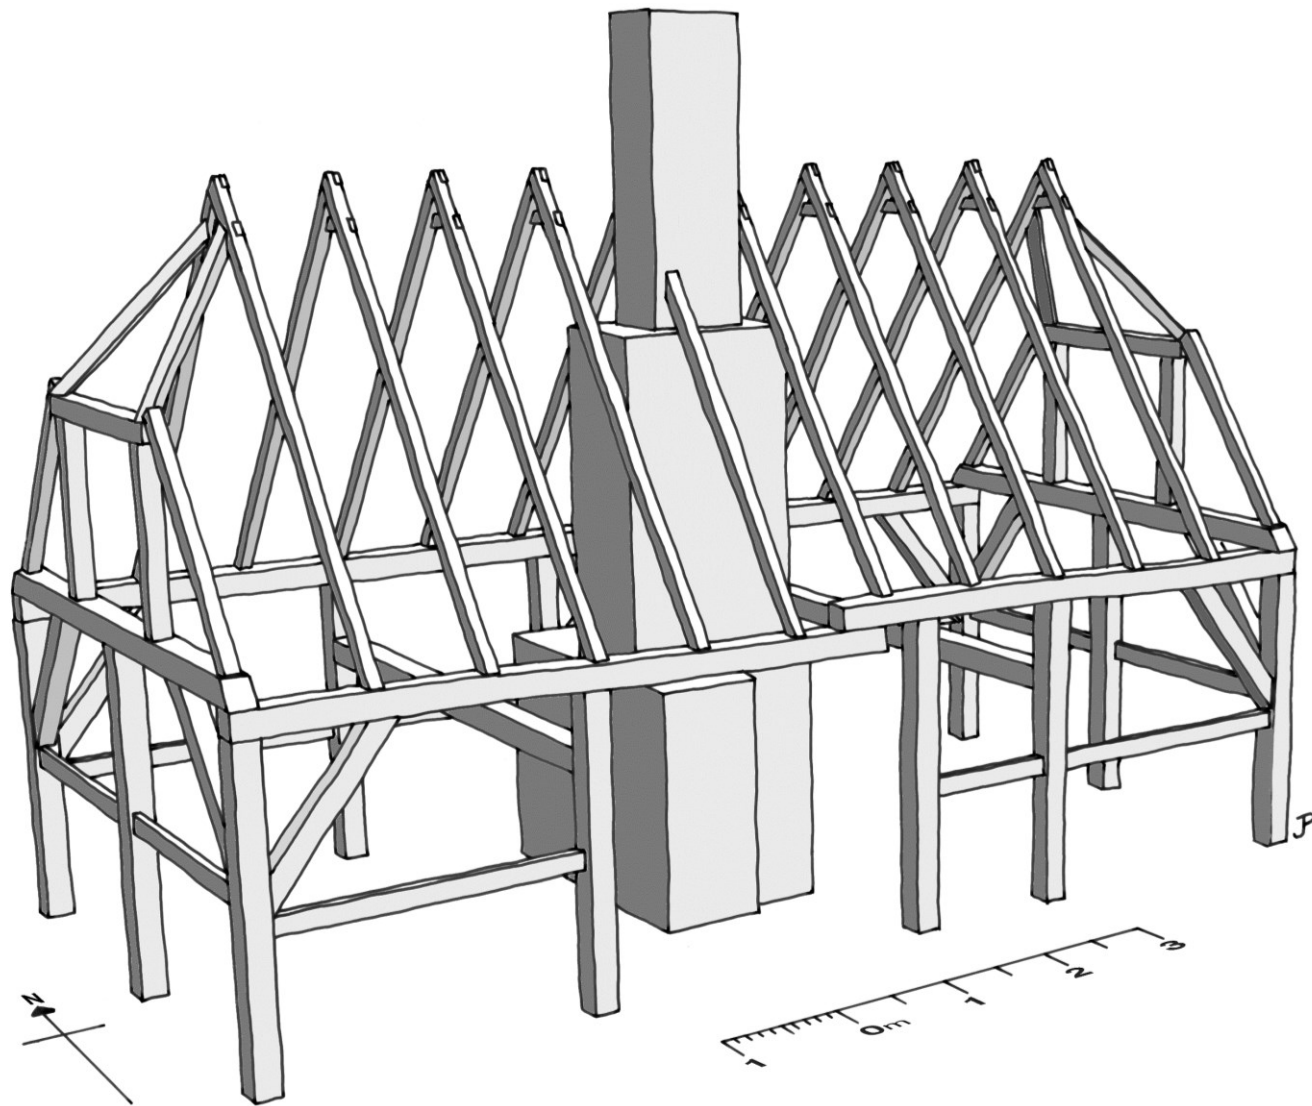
Reconstruction of Mill Cottage from the south-west, with conjectural half-hipped roof
